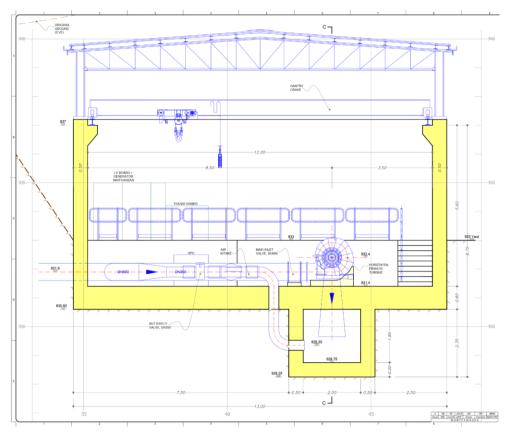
Powerhouse – Vertical Cross-section (Section A) (Studio Pietrangeli, 2019)
